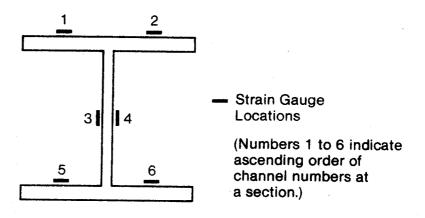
Locations of Strain Gauges at Various Sections of the Full-Size Stub-Girder
